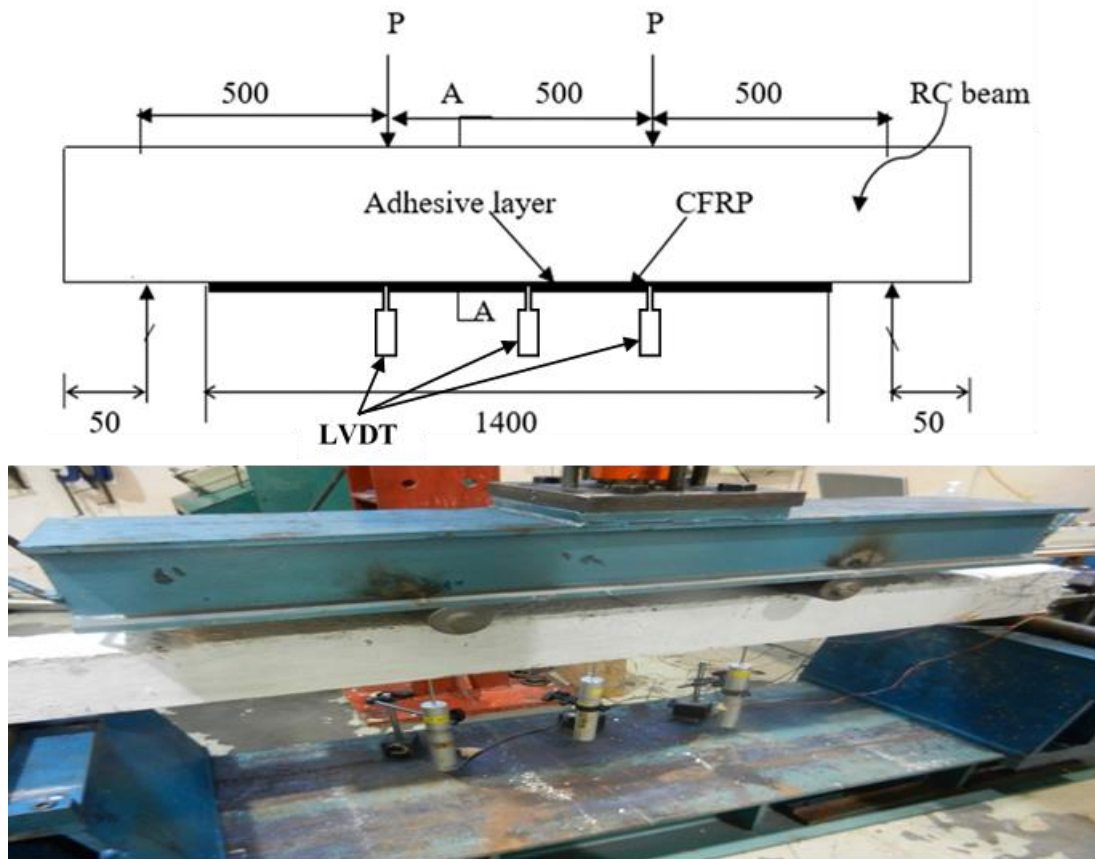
Instrumentation and testing set-up (Schematic and laboratory diagrams)
